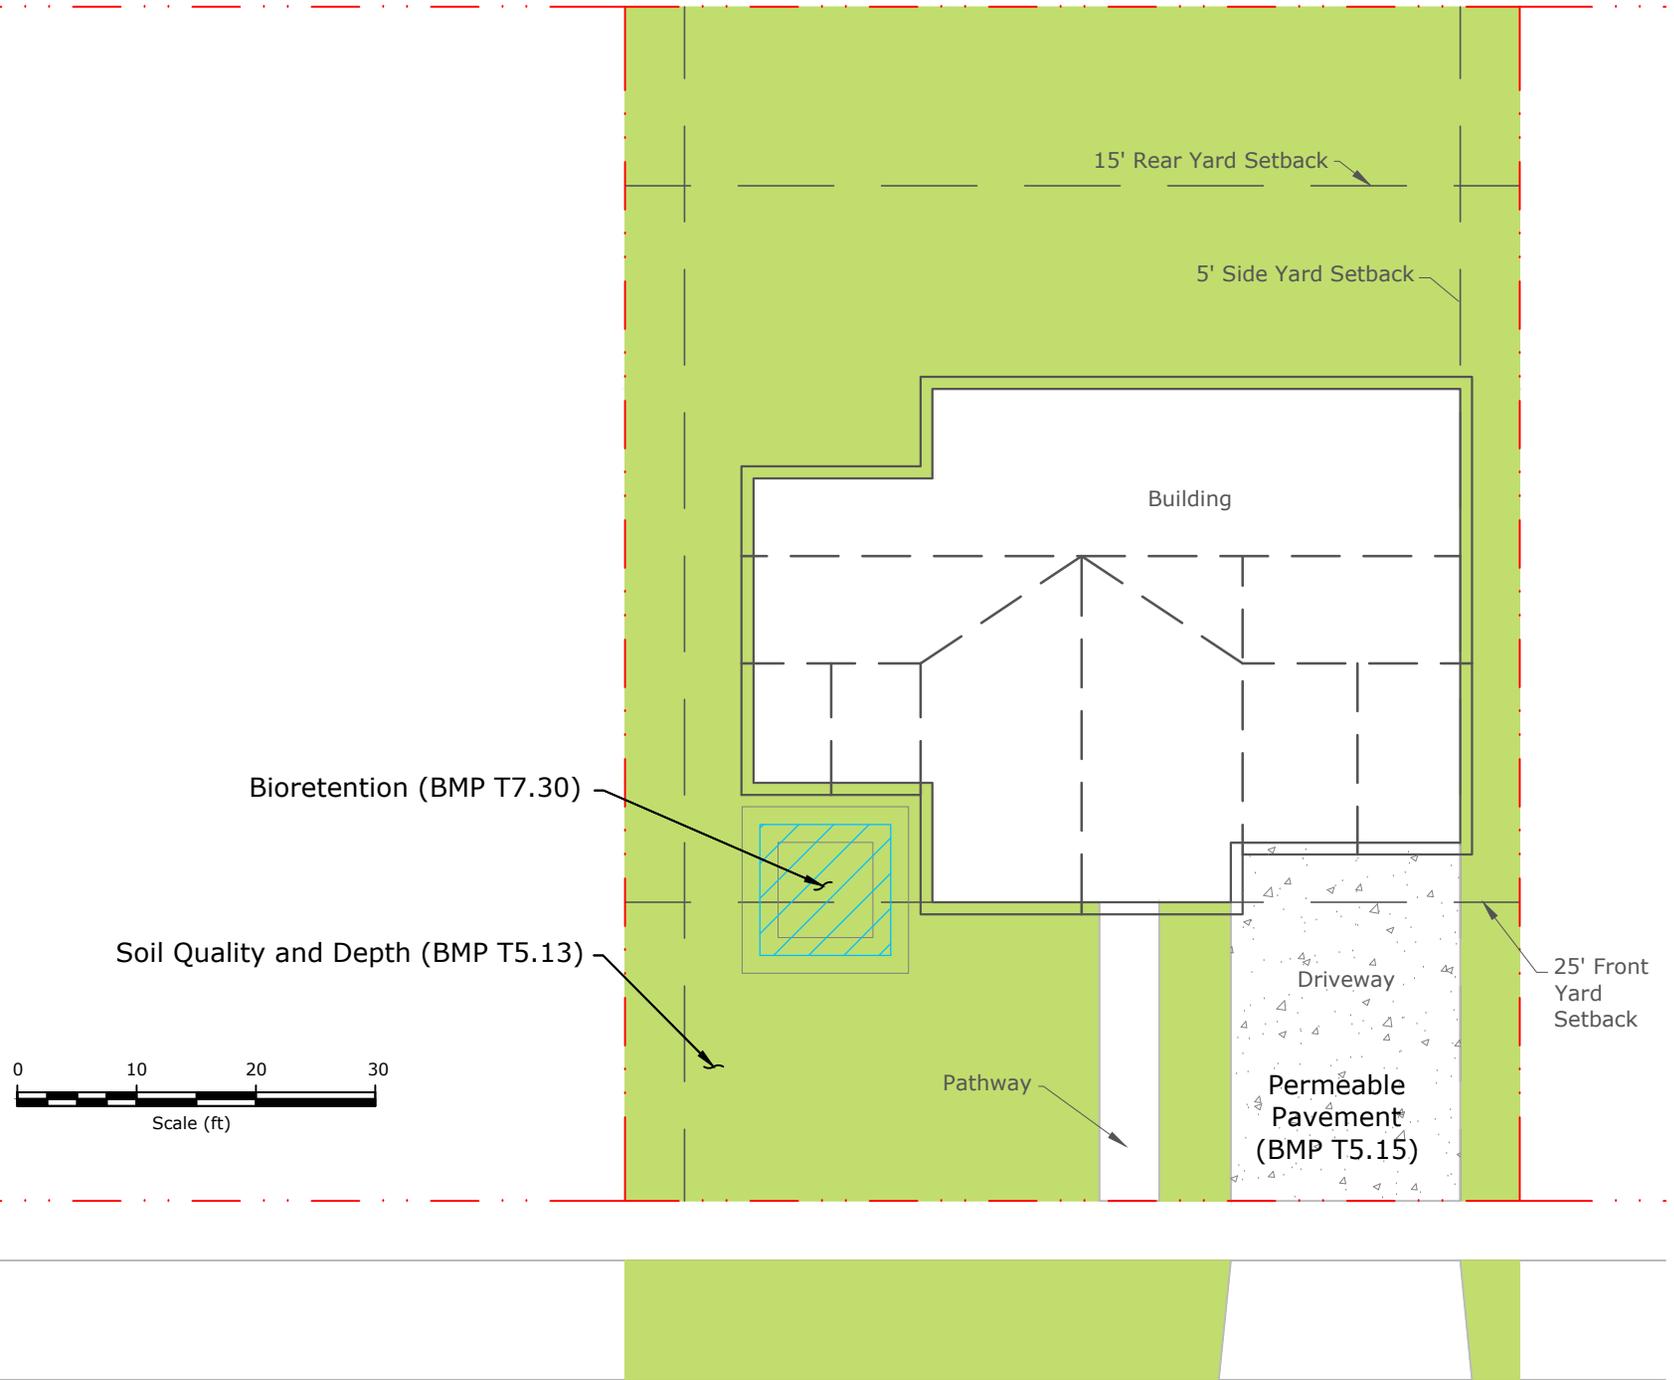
Scenario 4. Permanent Stormwater Site Plan - Typical Single-Family Residential Parcel, 2012 Requirements, Till Soils
